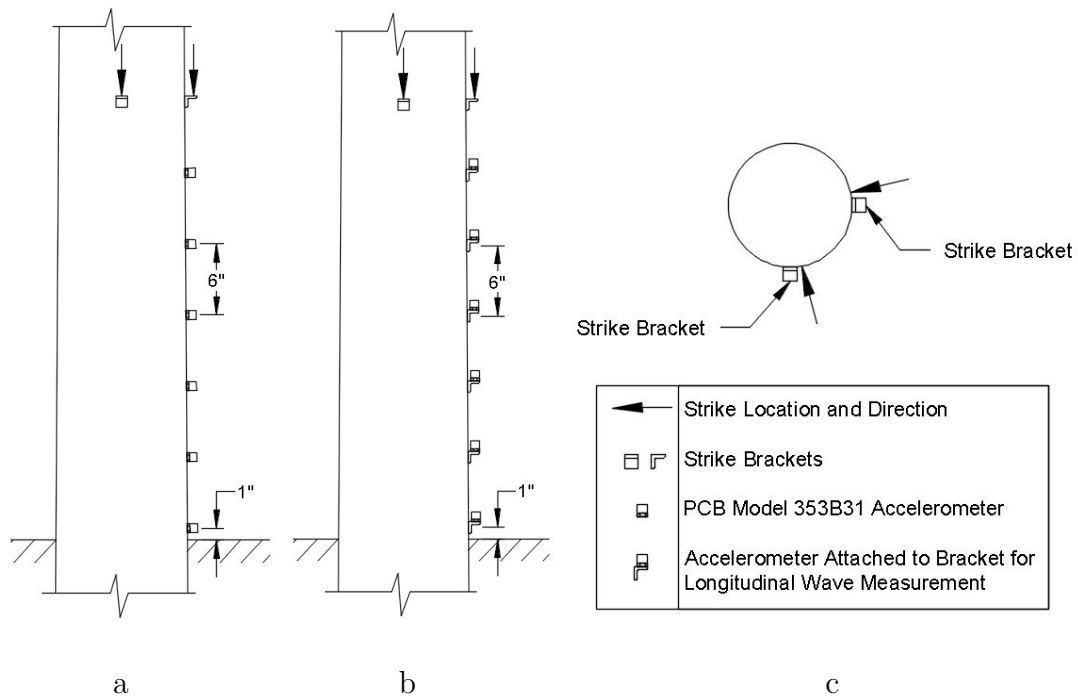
Stress wave testing sensor and impact locations and orientations: a) horizontal accelerometer layout; b) vertical accelerometer layout; c) cross sectional locations for both accelerometer layouts
